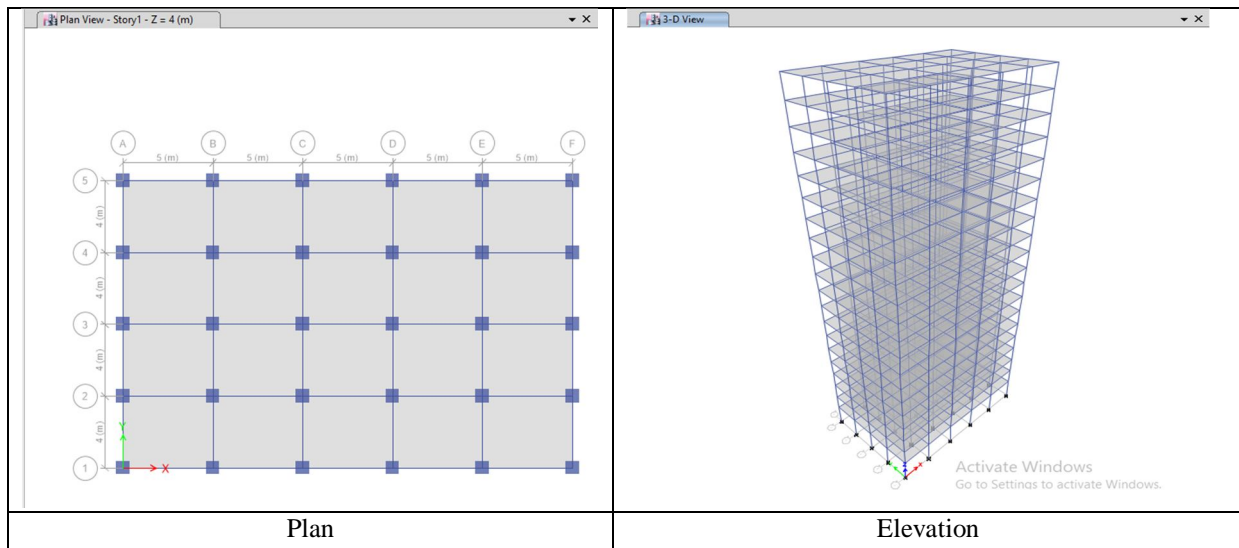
Geometric of G+20 storied reinforced concrete frame model with Conventional slab in CSI ETABS
